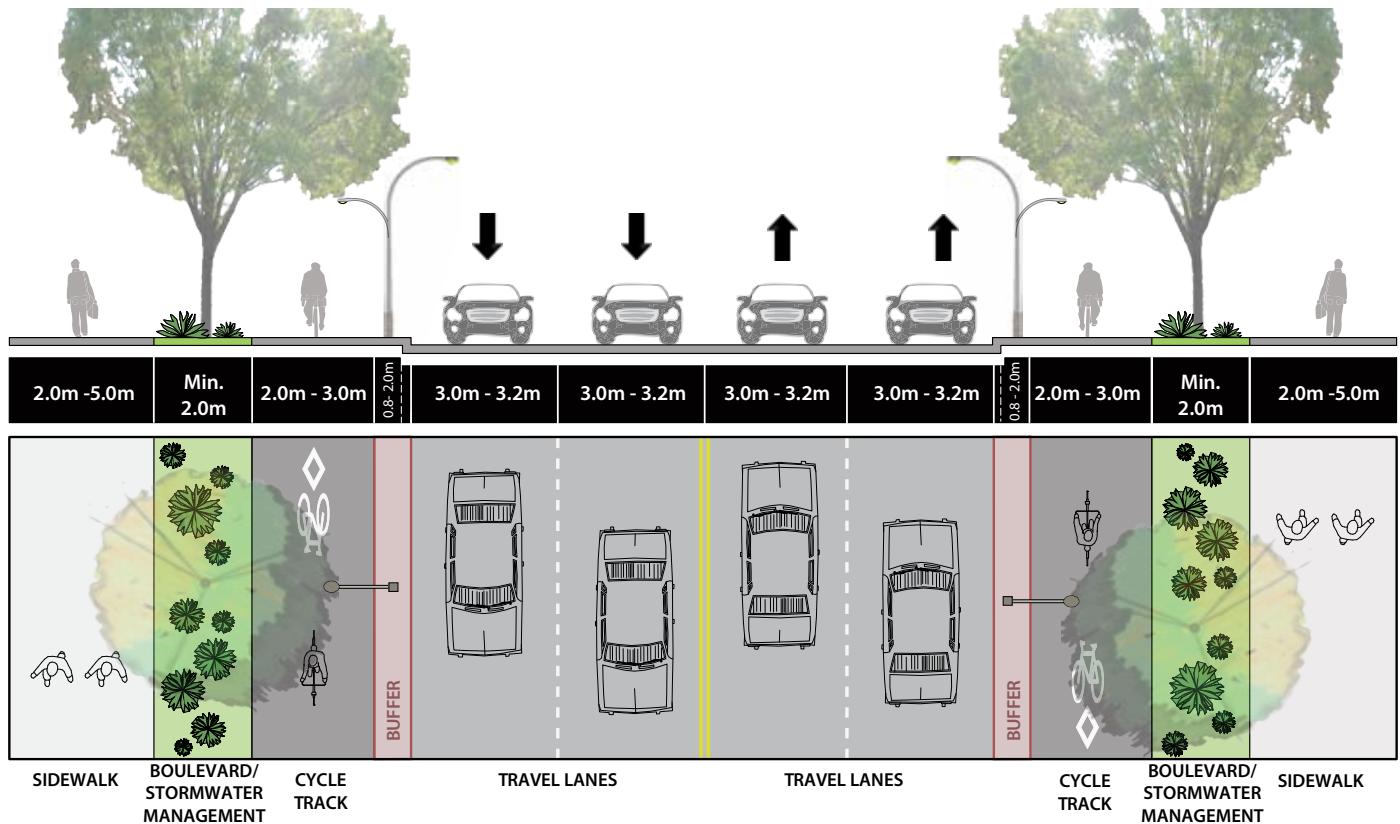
| Mid-term Shelbourne Street Cross-Section
